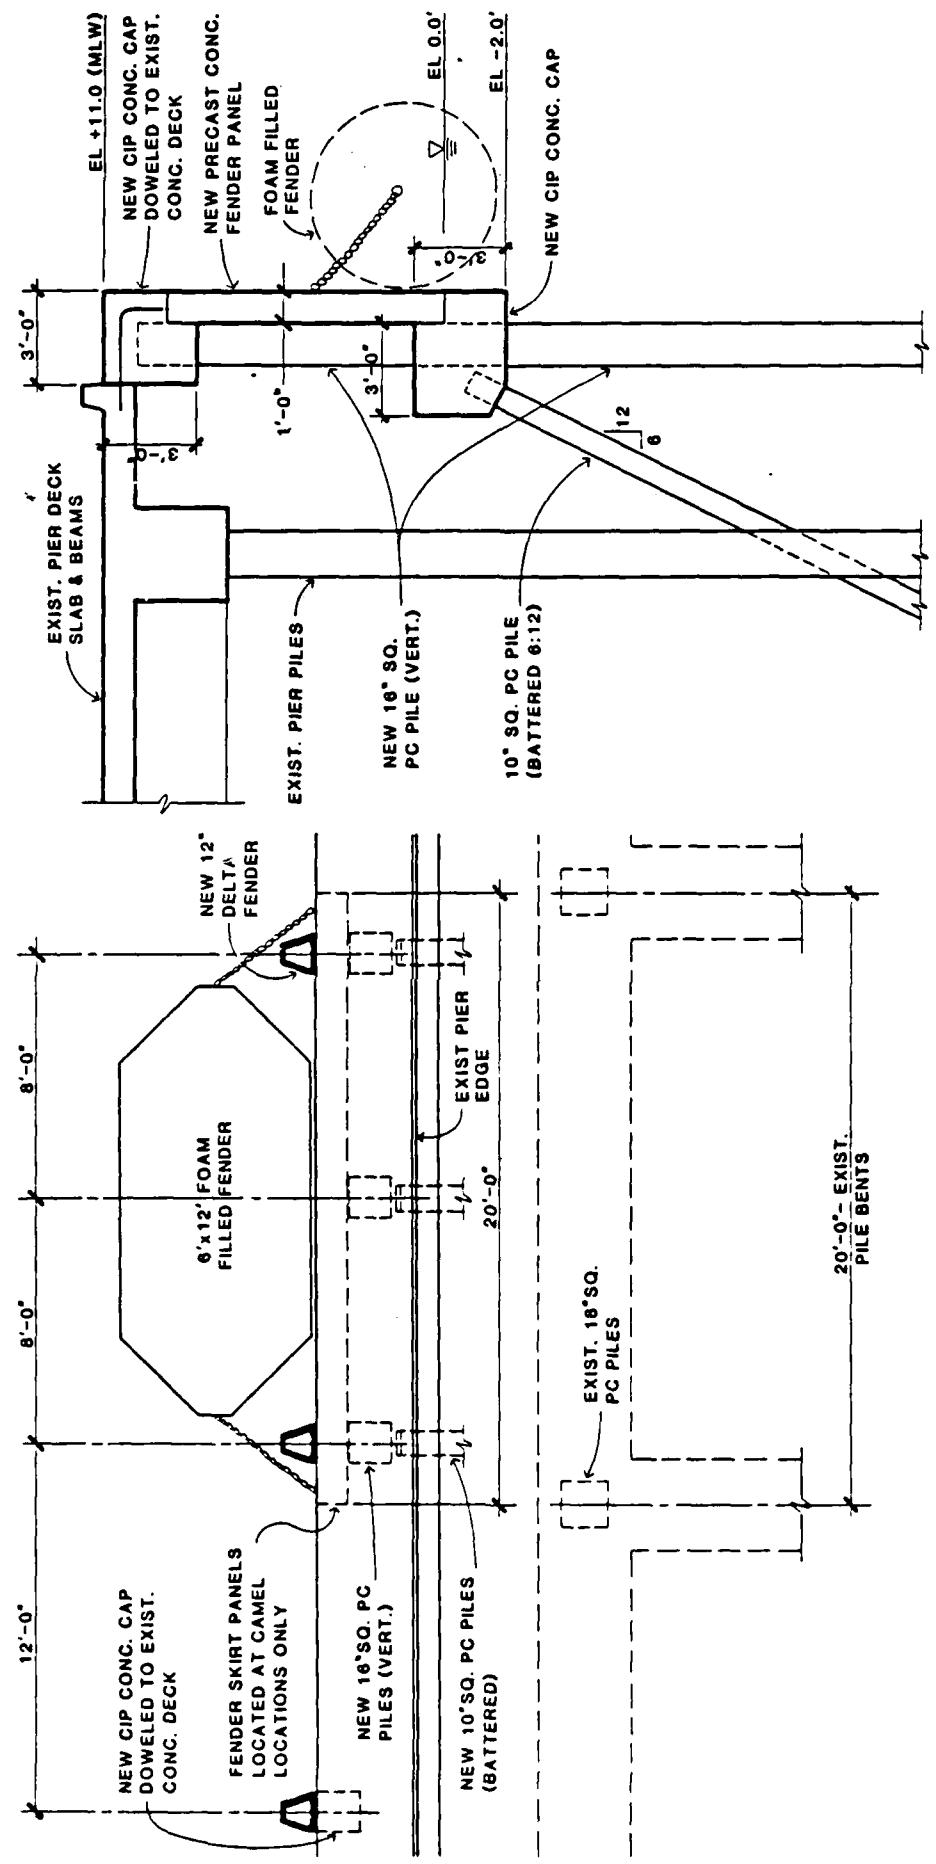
Concrete Fender System Using Concrete Battered Piles
